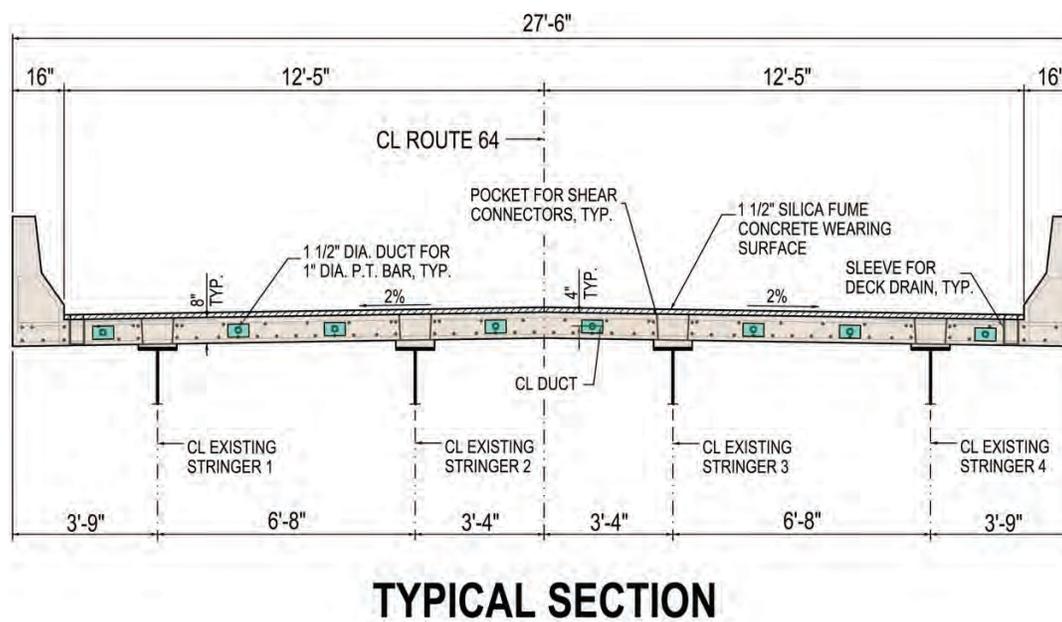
Lake Pomme de Terre bridge deck panels, typical section.
